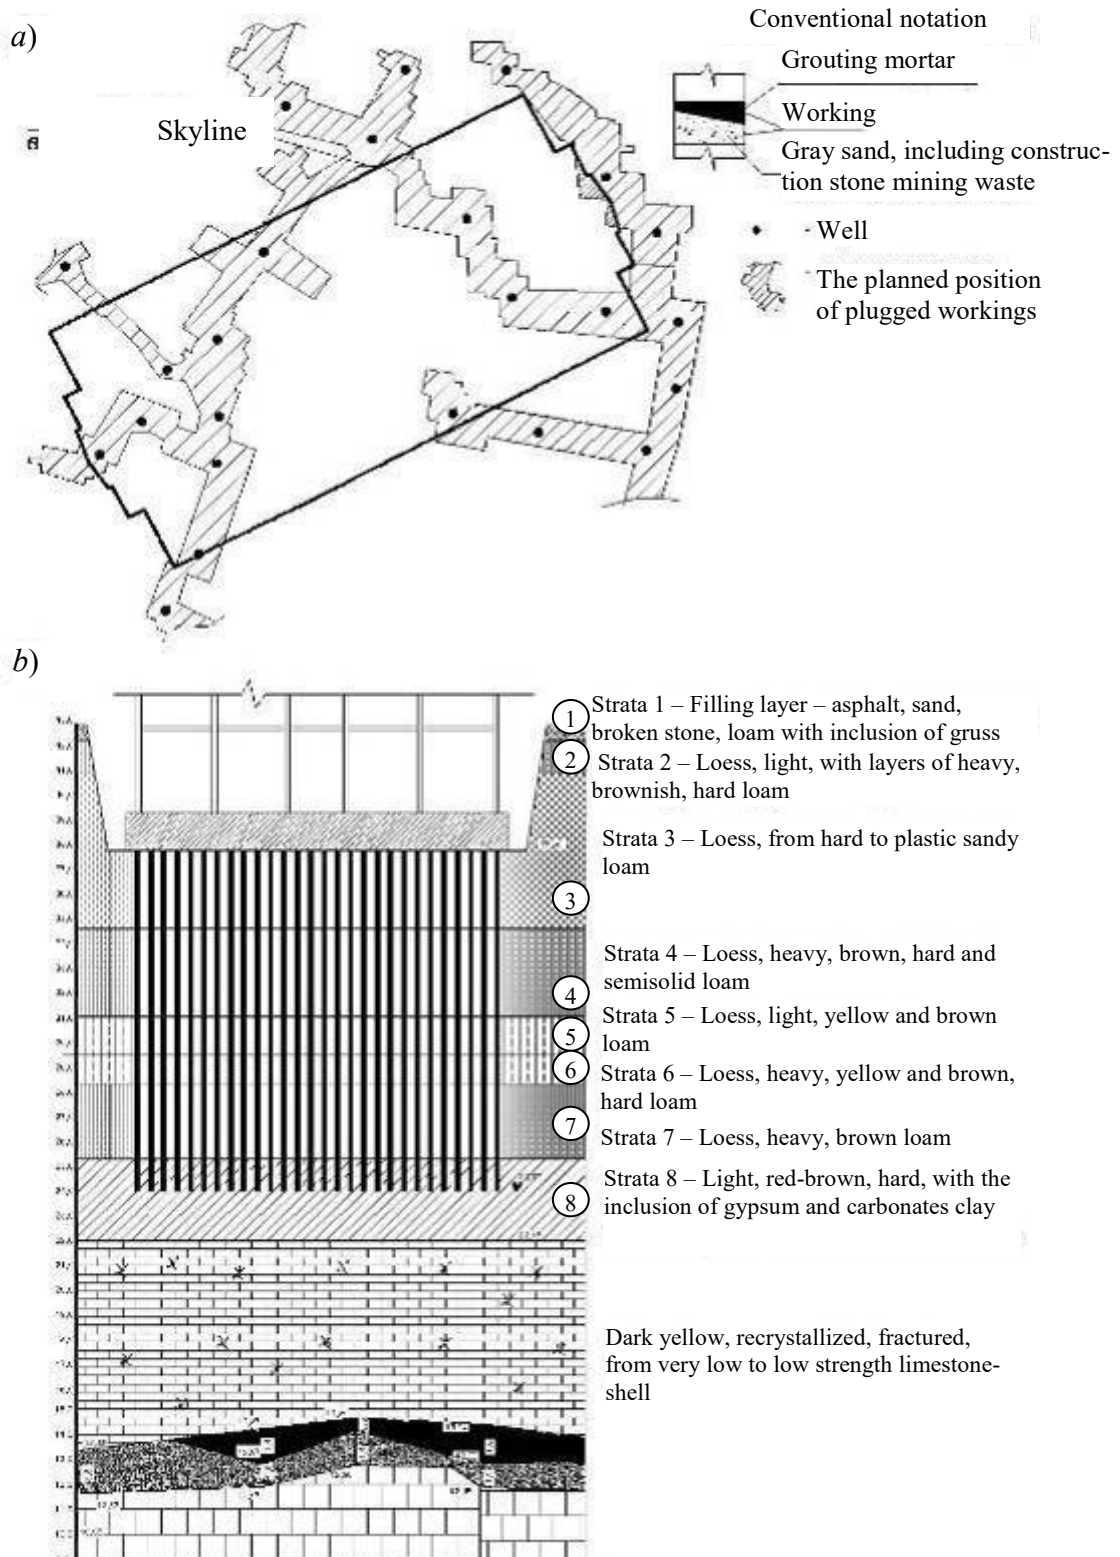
The location of the underground workings in the plan (a) and on the combined section (b)
